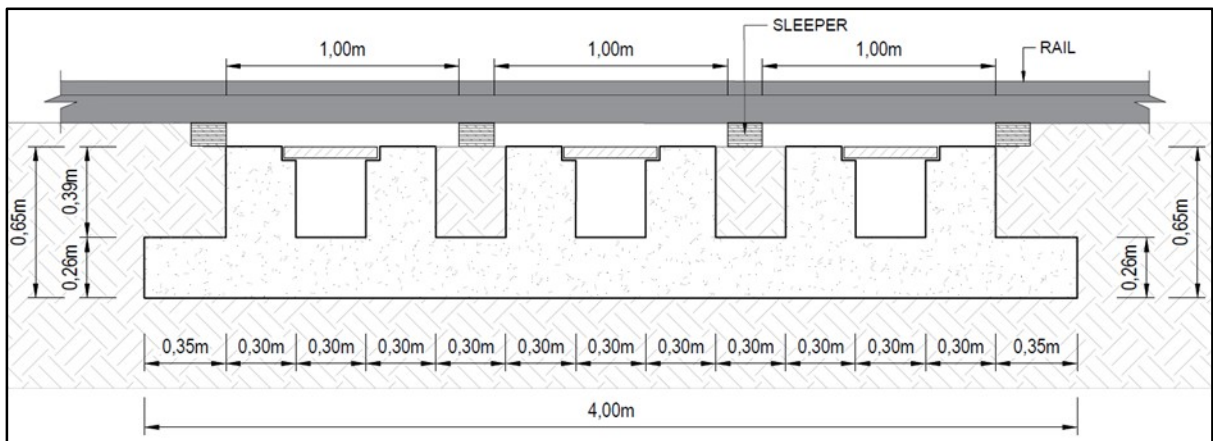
Section of proposed channels at railway crossing 1 between positions IAE SW1 and IAE SW2
